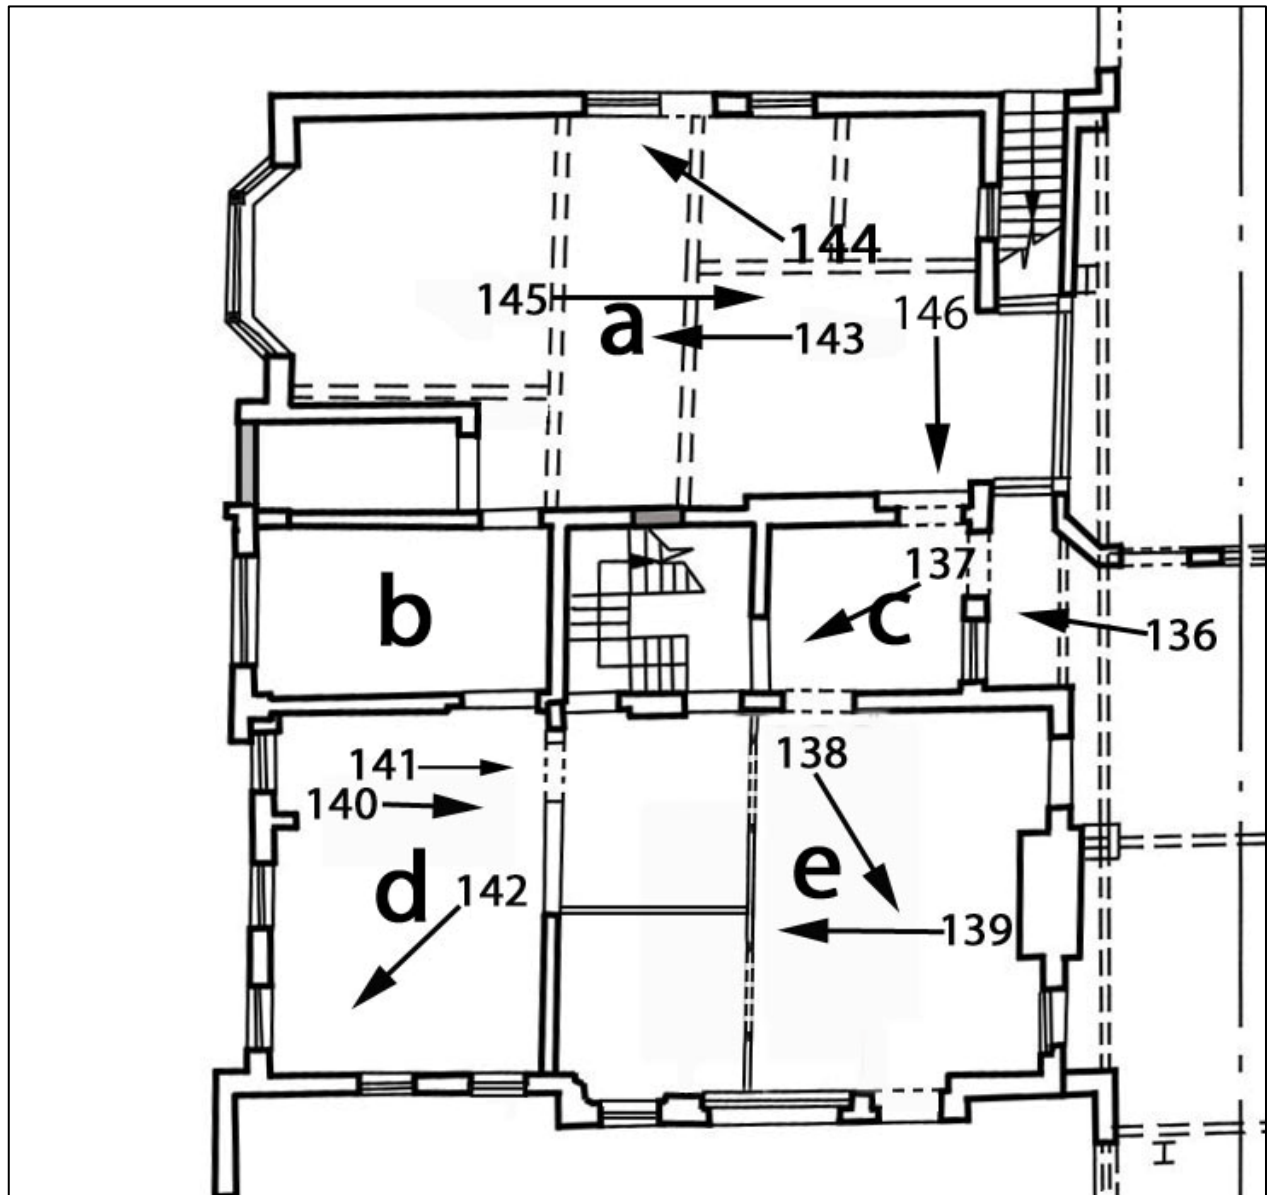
Photographic viewpoints on the ground floor of building 'GF1'.
